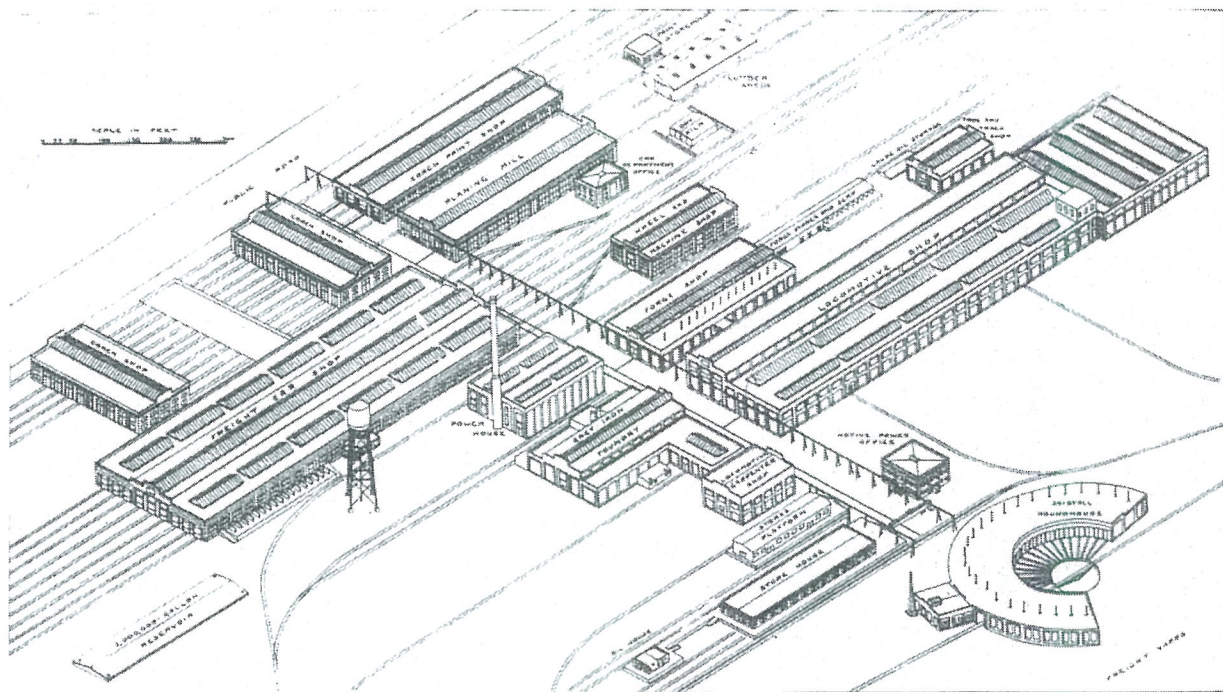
Isometric Projection of Locomotive and Car Department Buildings, National Transcontinental Railway
